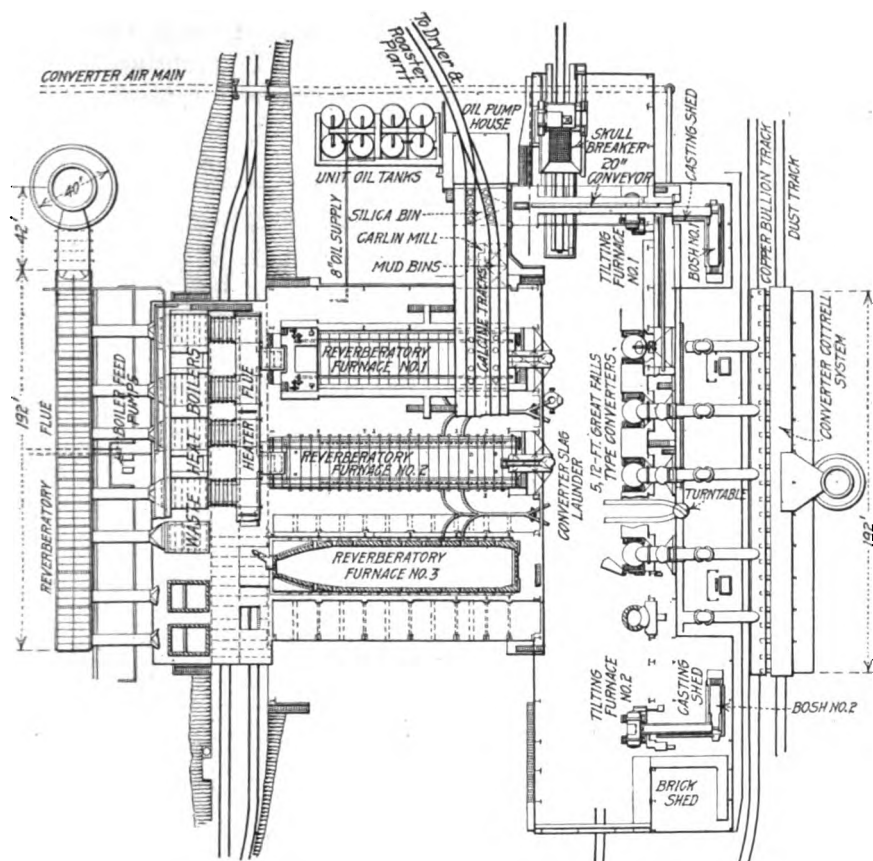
PLAN OF INTERNATIONAL SMELTING CO.'S PLANT.
